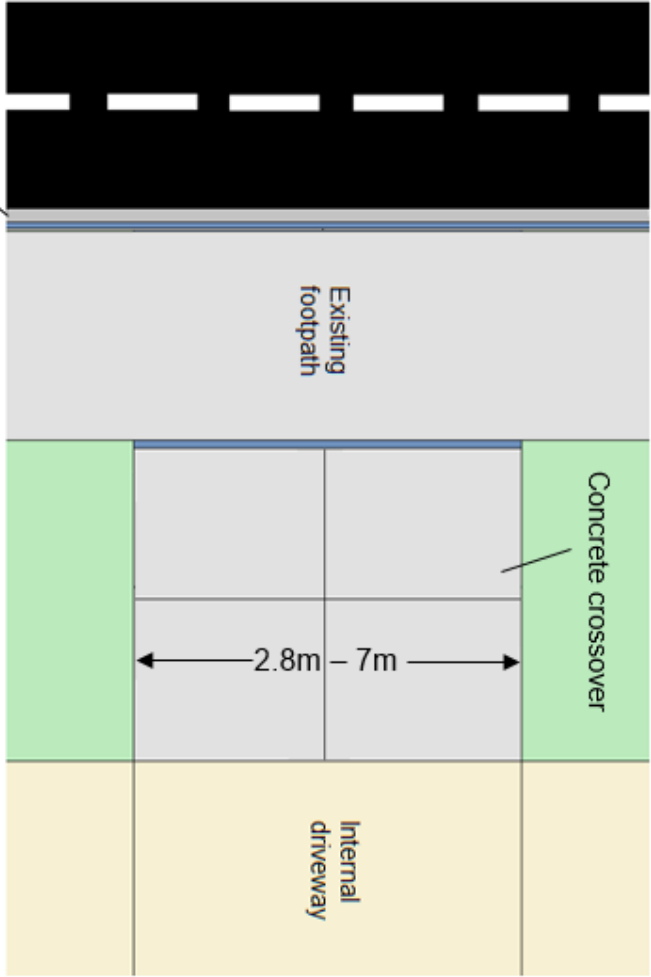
Expansion/Construction Joint Placement and Location of Crossover
